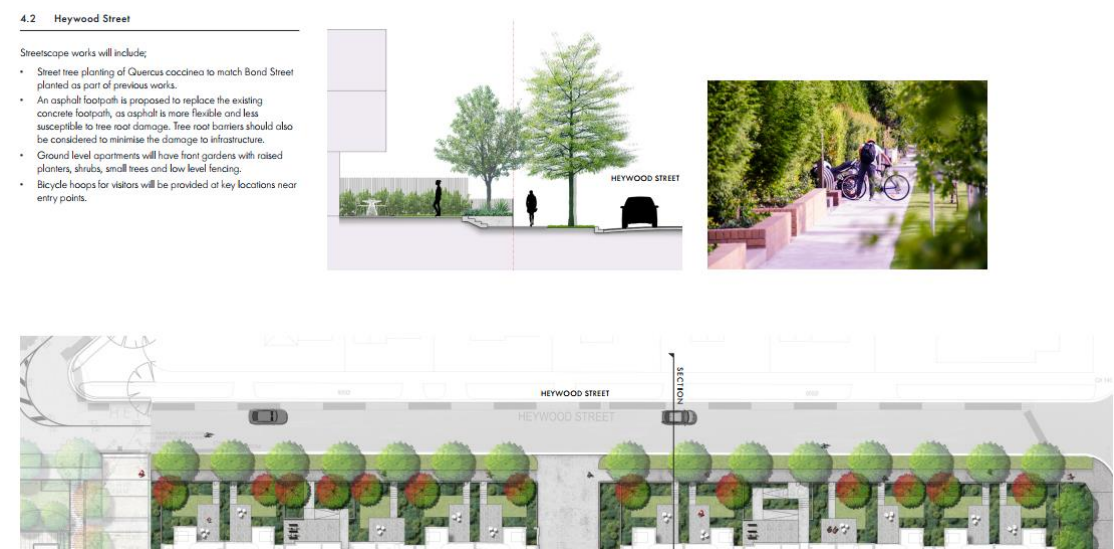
Extract of landscape plan (Appendix K) – Heywood Street
